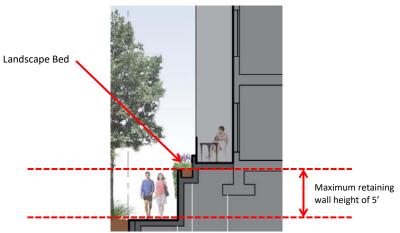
Sidewalk-adjacent retaining wall requirements.
